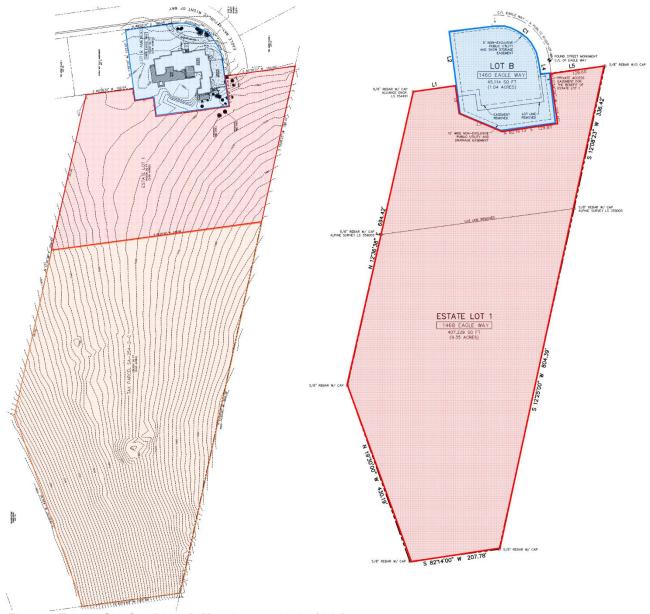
Existing Site Conditions (left) and proposed plat (right).
